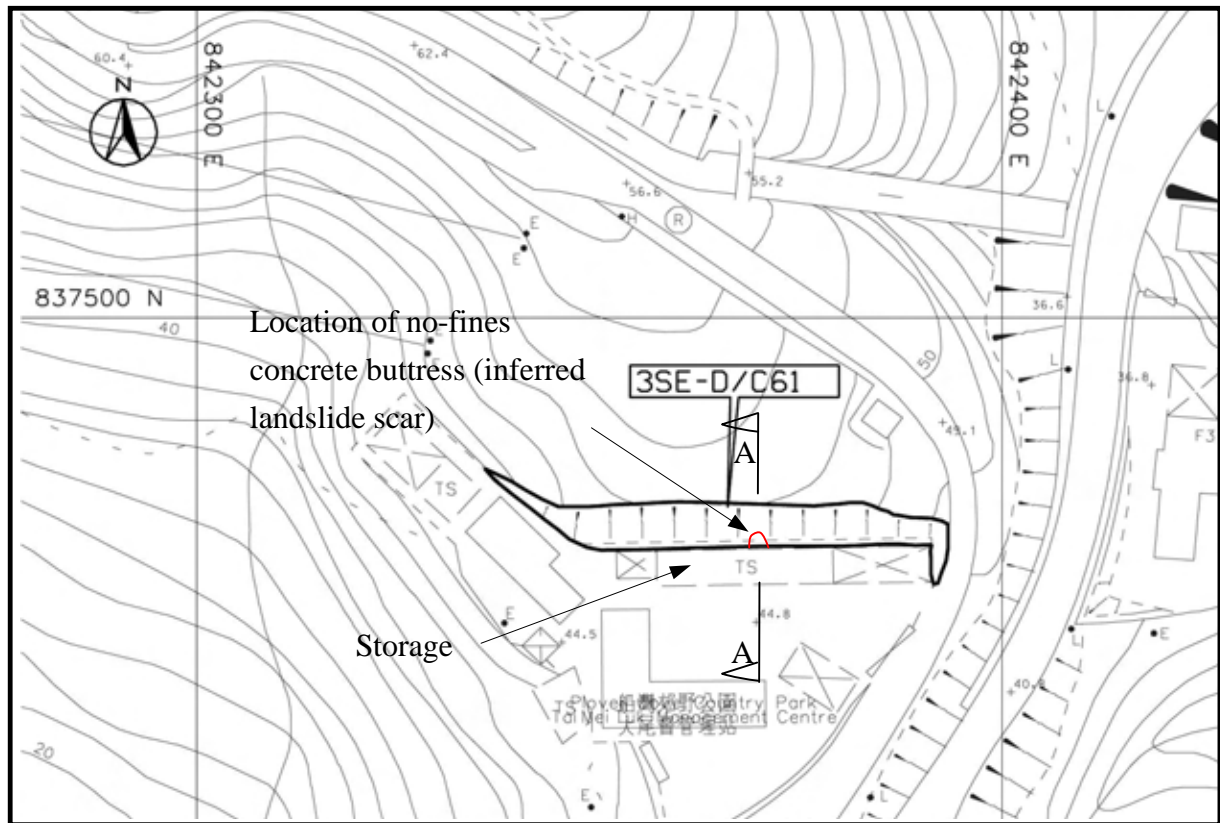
Site Layout Plan (Slope No. 3SE-D/C61)
